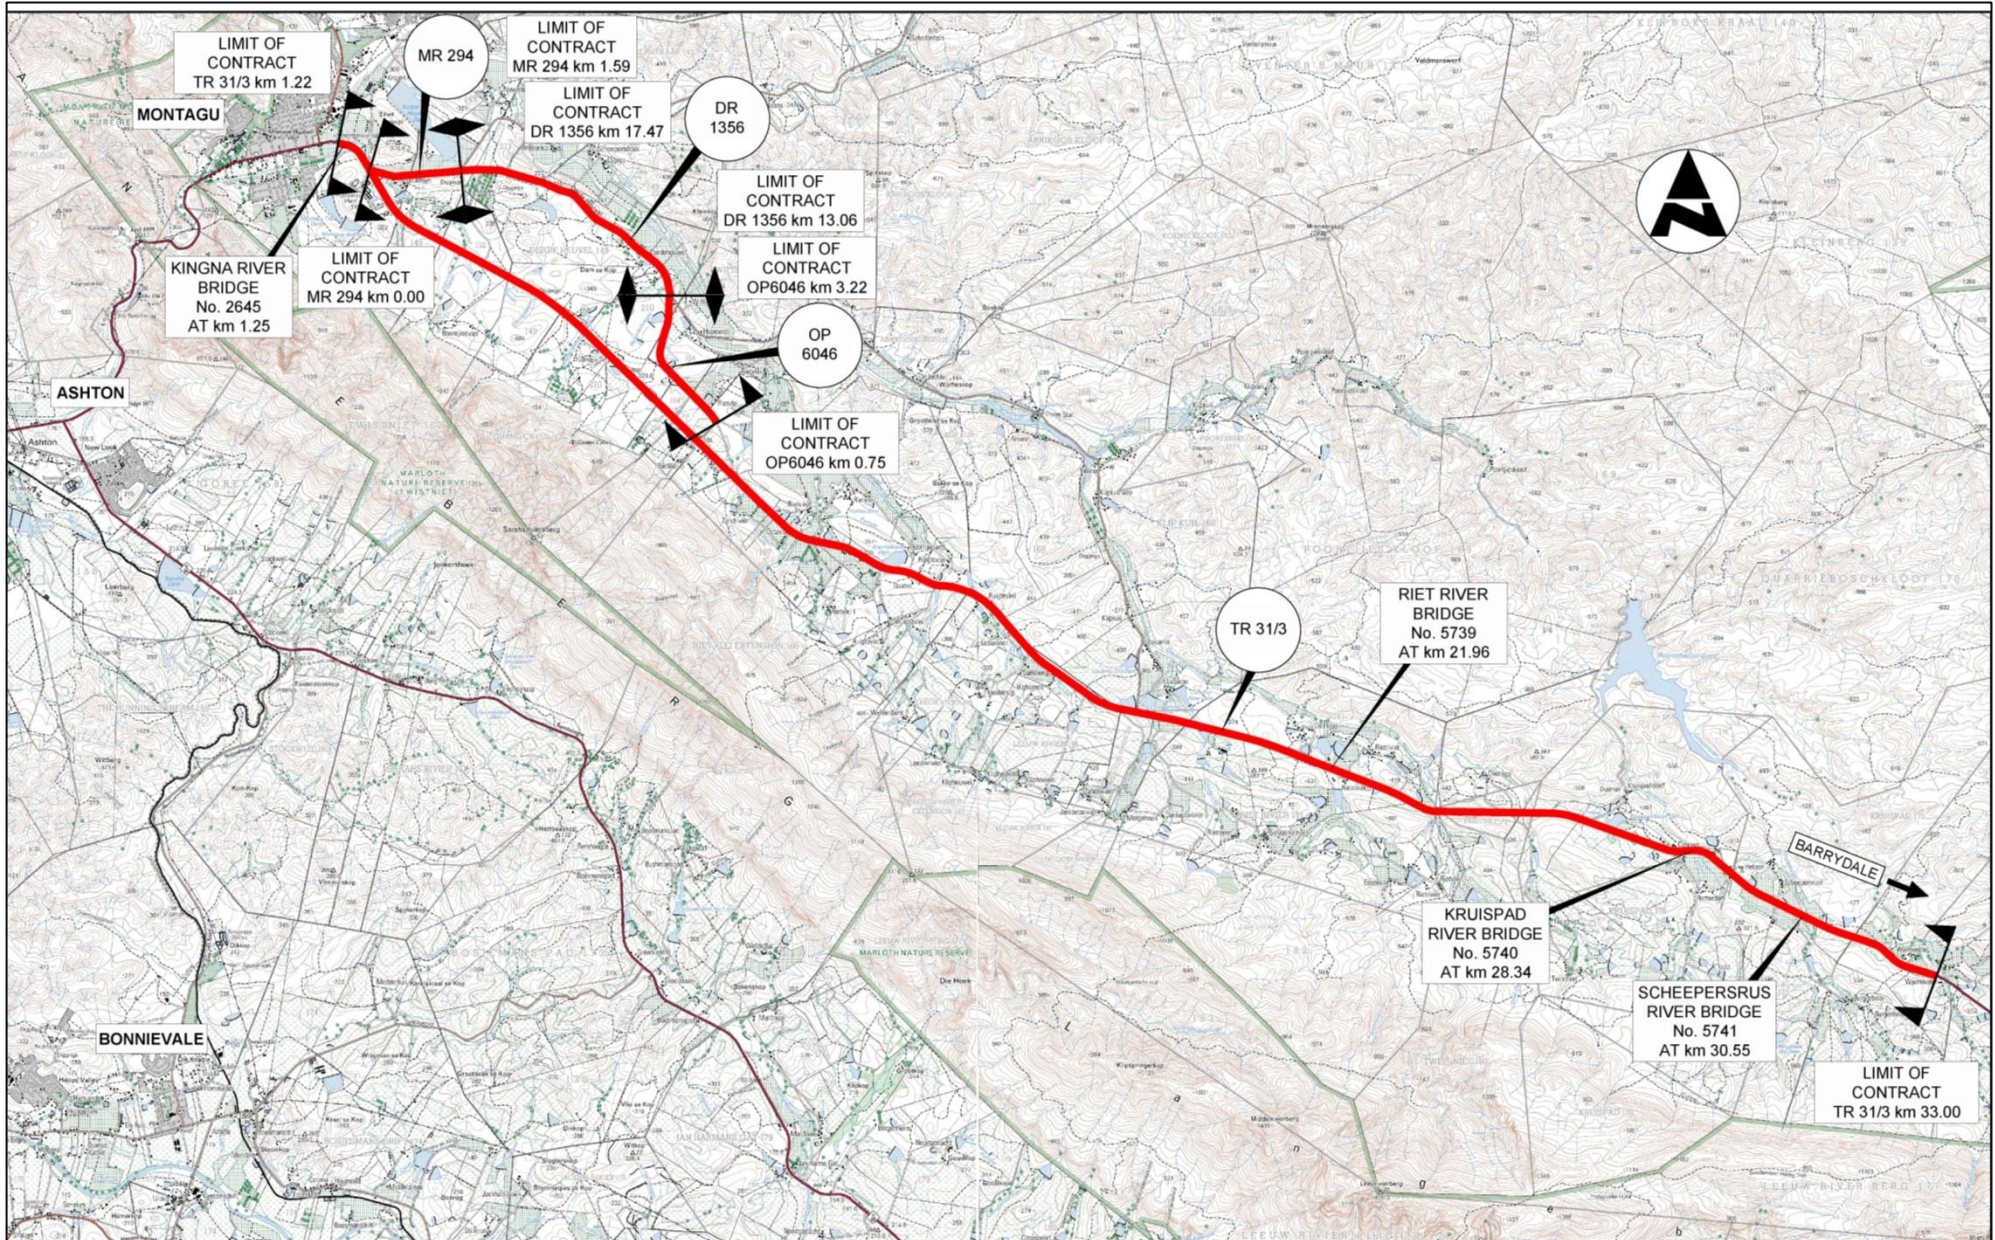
Locality plan (Sheet 2 of 2) showing the segment of TR31/3, MR 294, DR 1356 and OP 6046 proposed to be re-sealed
